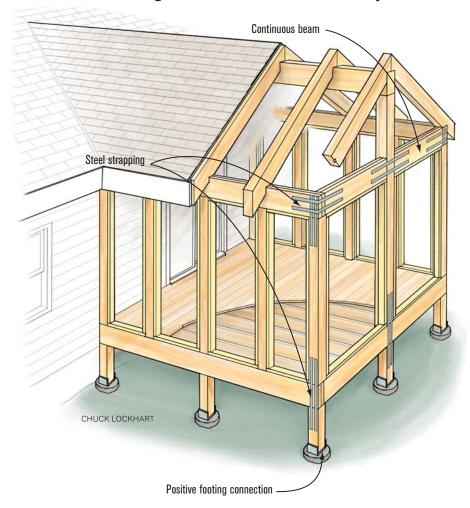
Steel strapping at the corners and at post connections helps keep a porch tied to the ground in severe winds. Gravity loads from the roof are carried to the posts through a continuous perimeter beam, and then to the ground.
